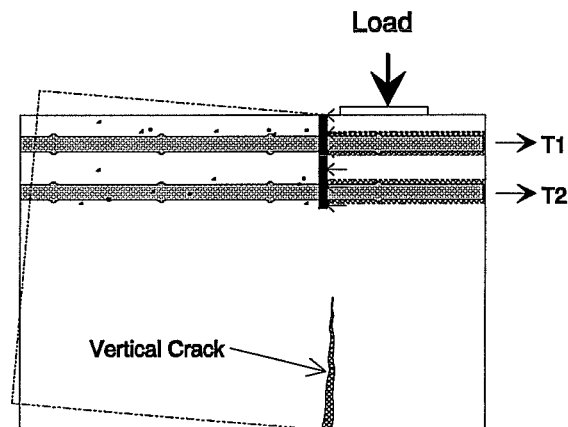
Vertical cacking in beam due to eccentricity of loading on section
